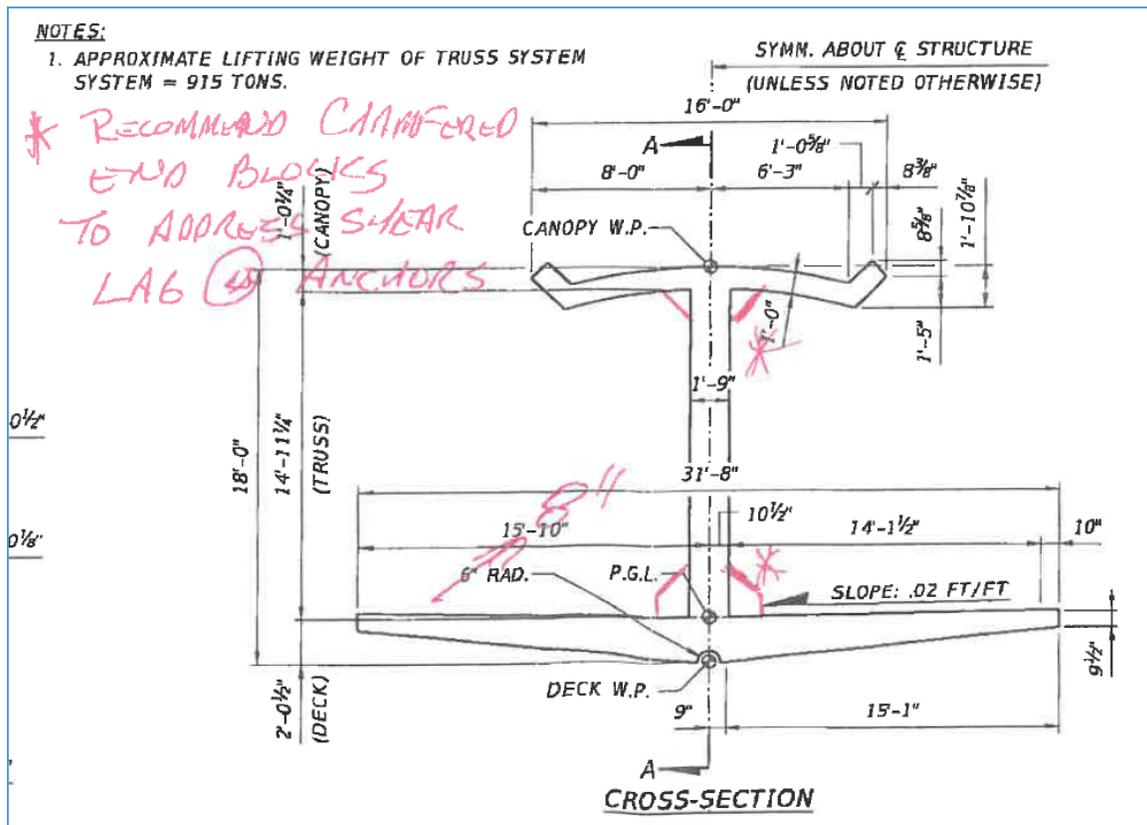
FDOT comments to FIGG on main span truss system layout, recommending chamfered end blocks to address shear lag at anchors. (Source: FDOT)
